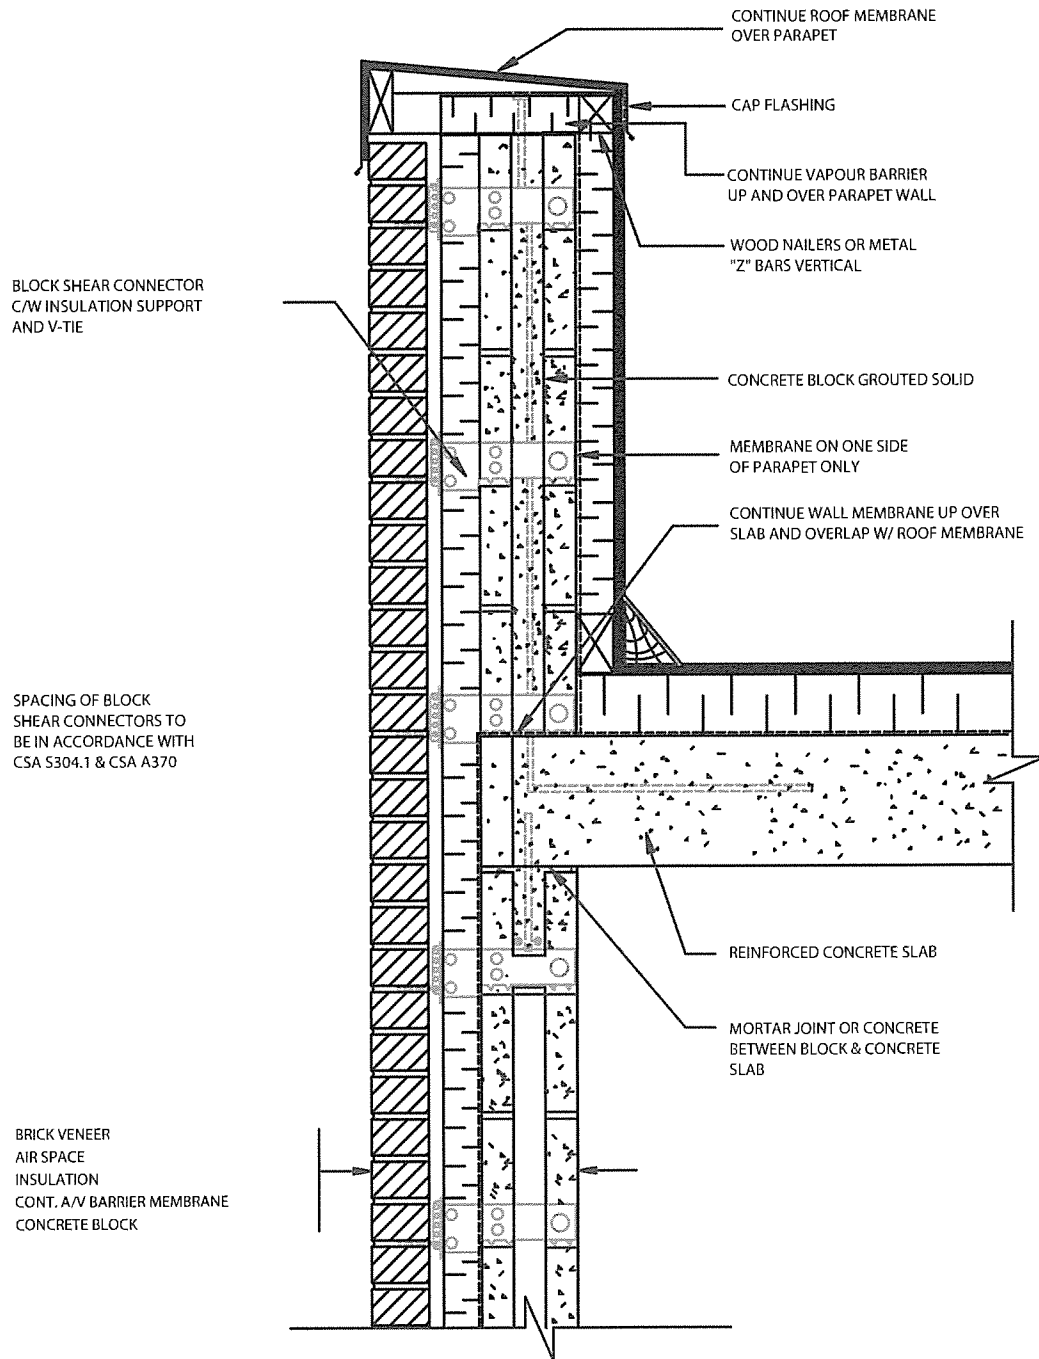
BRICK VENEER/CONCRETE BLOCK-DETAIL AT HIGH PARAPET
